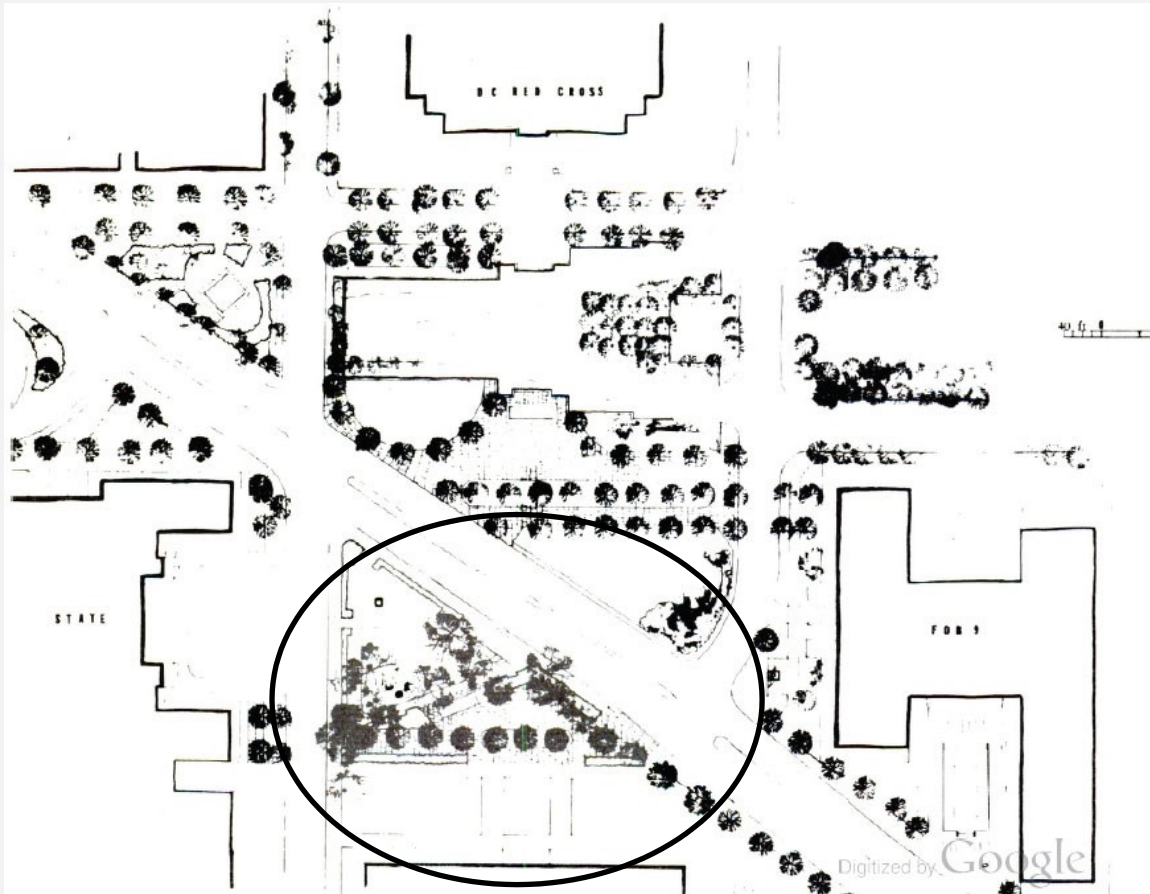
Illustration of Virginia Avenue Plan between 20th and 21st Streets from the 1964 Special Streets Plan. Reservation 378/105 is circled.
